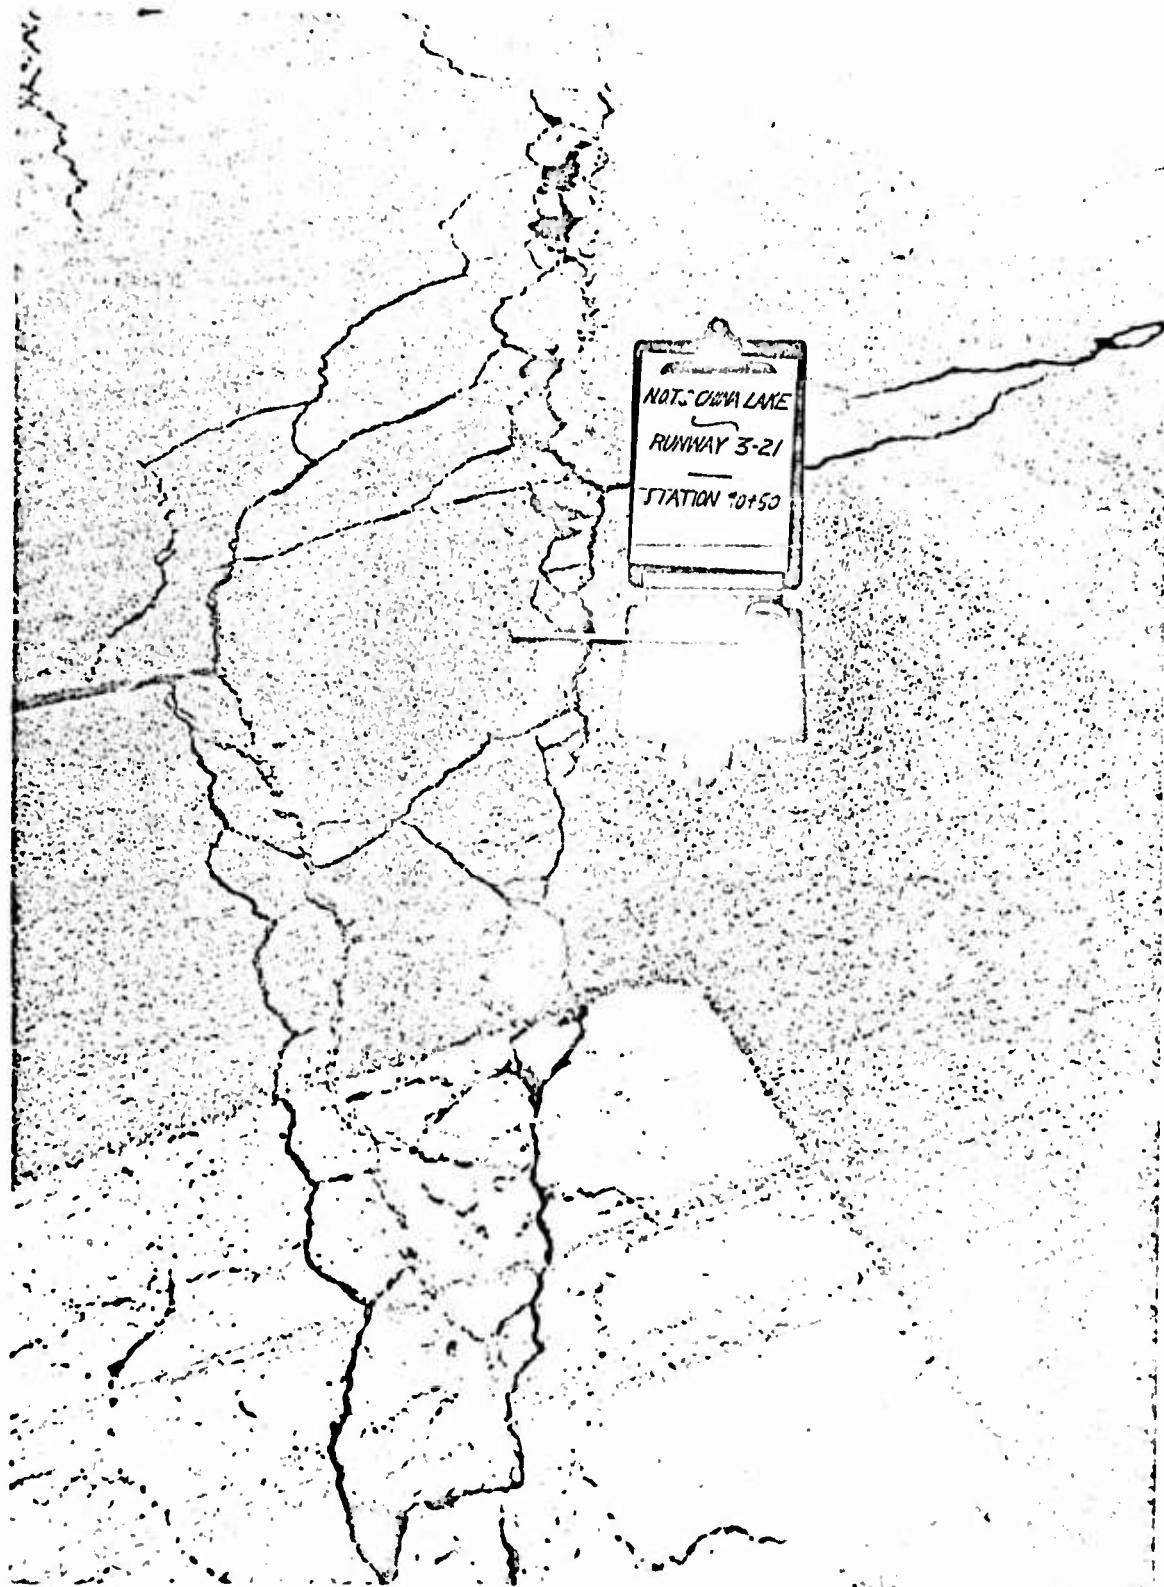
Severe cracking and spalling combined with raveling on Runway 3-21, U. S. Naval Air Facility, China Lake, California. 43
